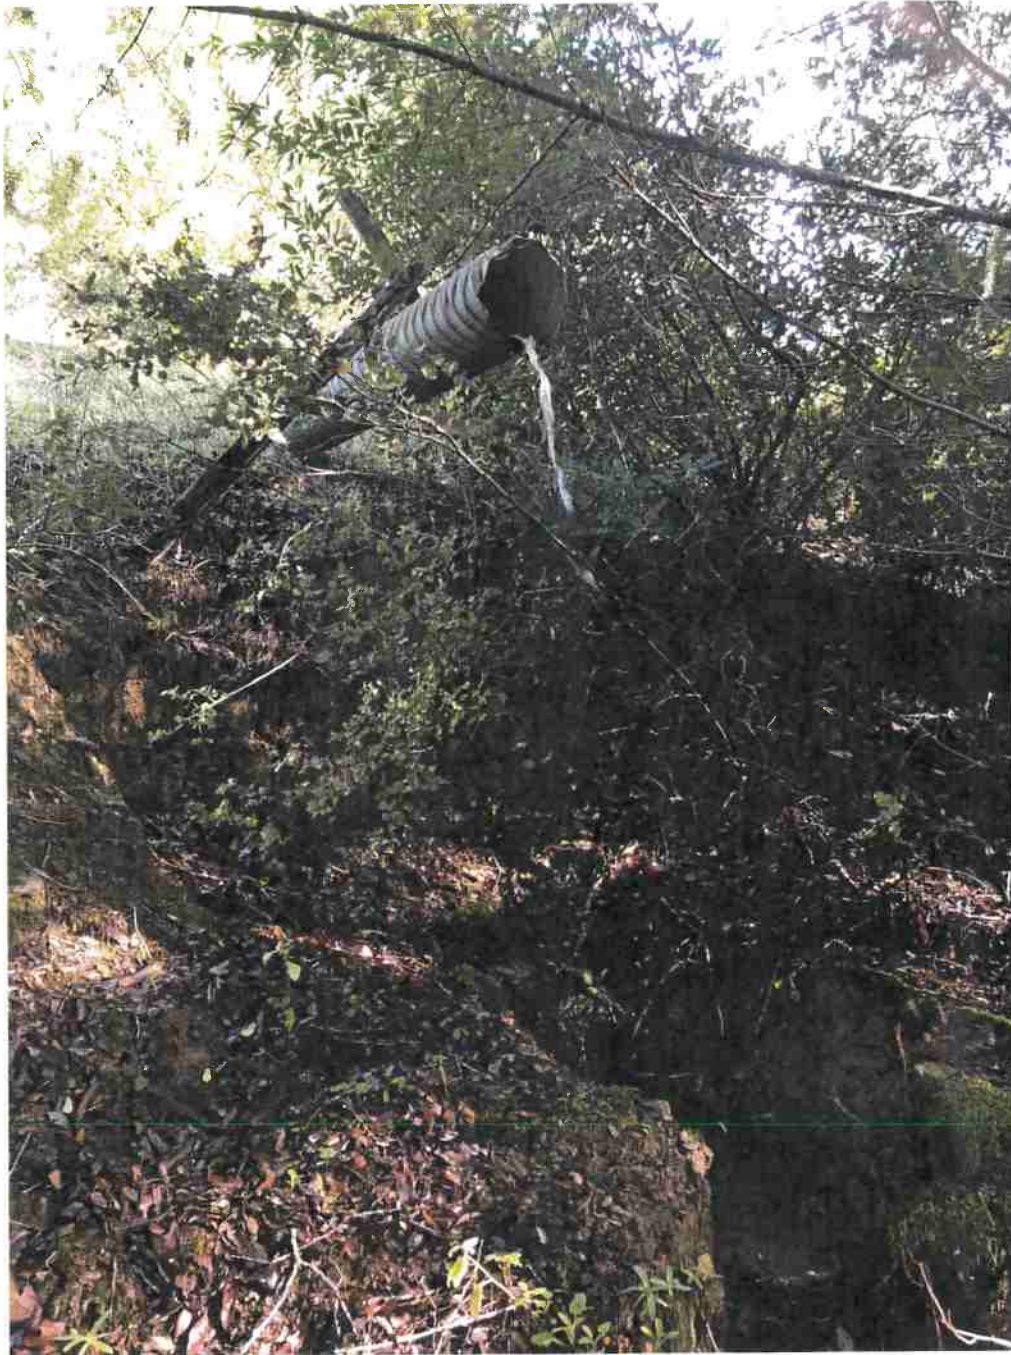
Crossing #6 outlet. Photo date 12-16-2016.
